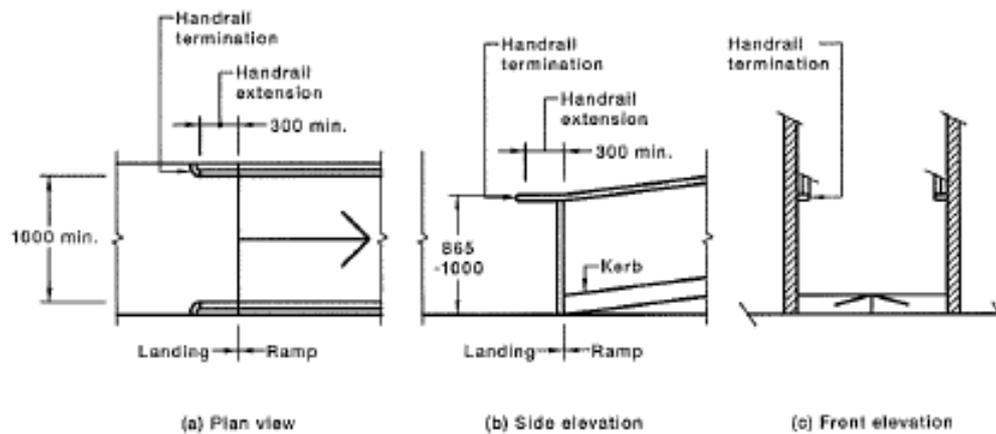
(A) RAMP HANDRAILS—EXAMPLES OF HANDRAIL TERMINATIONS
